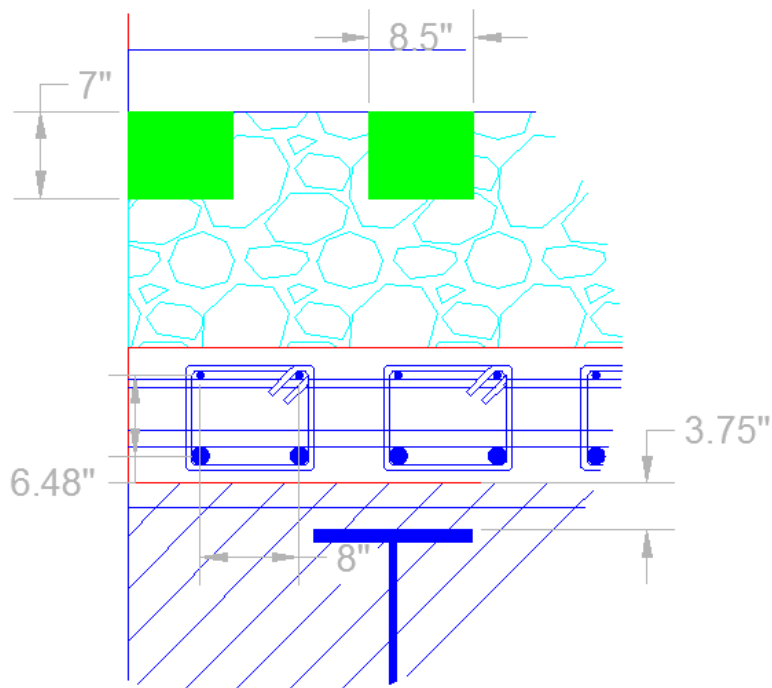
Drawing #5: Reinforcing Detail from Longitudinal View
